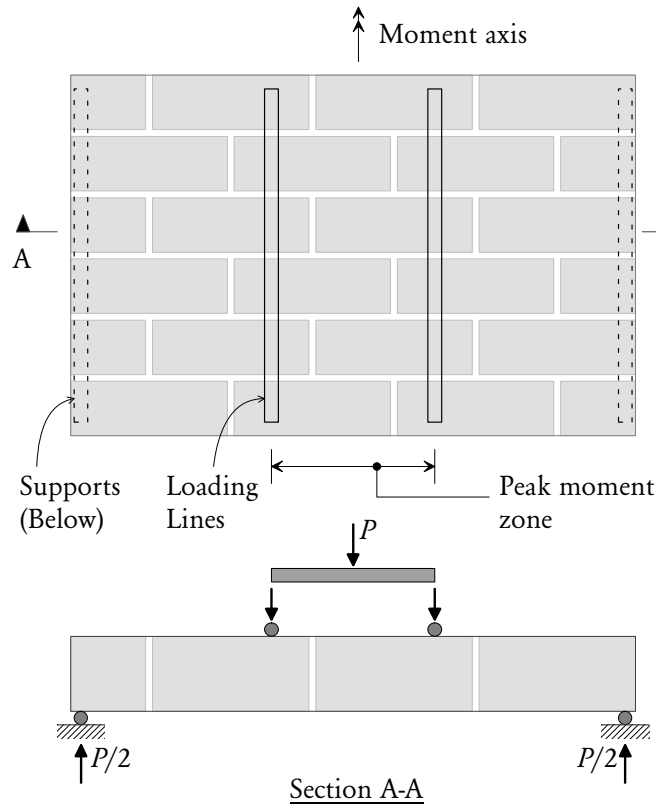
Typical wallette beam test setup in which the specimen is subjected to pure horizontal bending [identical to arrangement used by Willis et al. (2004)]. The brick masonry shown is built with half-overlap stretcher bond.
